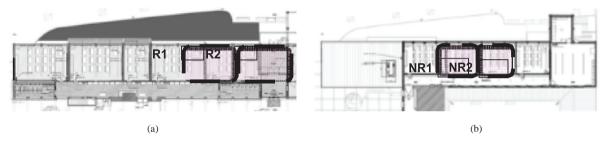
School building layout. (a) ground floor; (b) top floor.
